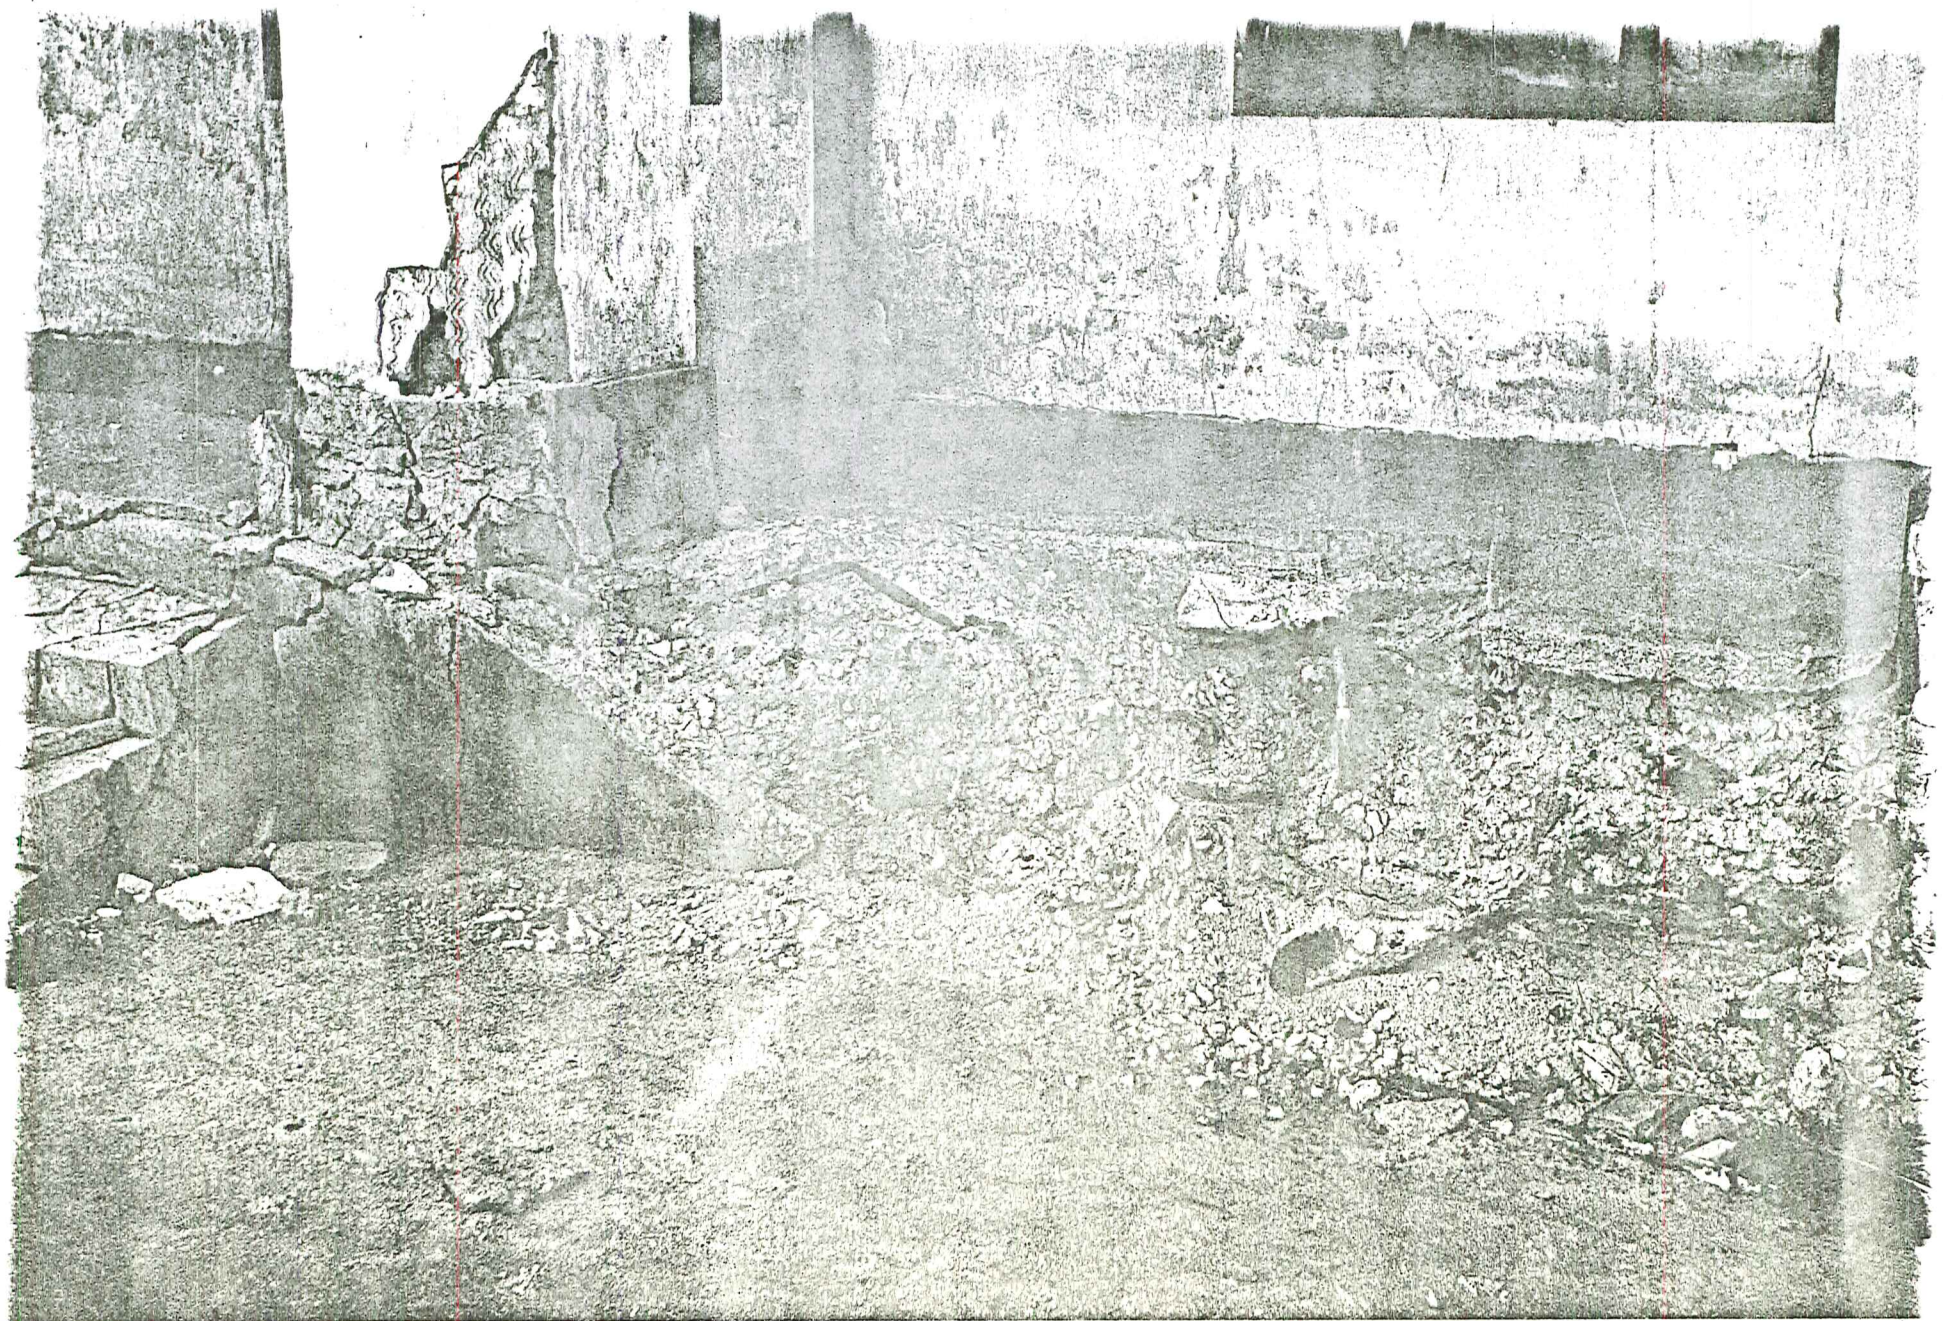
Destruction by salt-weathering of concrete blocks in walls of buildings at Samahij (Muharraq Island).
